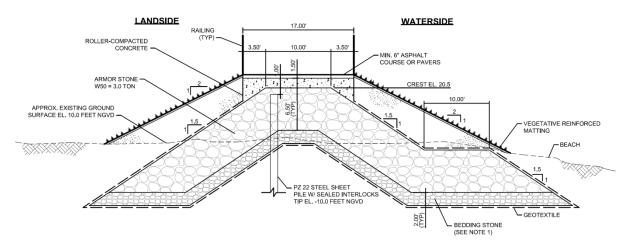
Buried Seawall Typical Section (Reach A-4)
